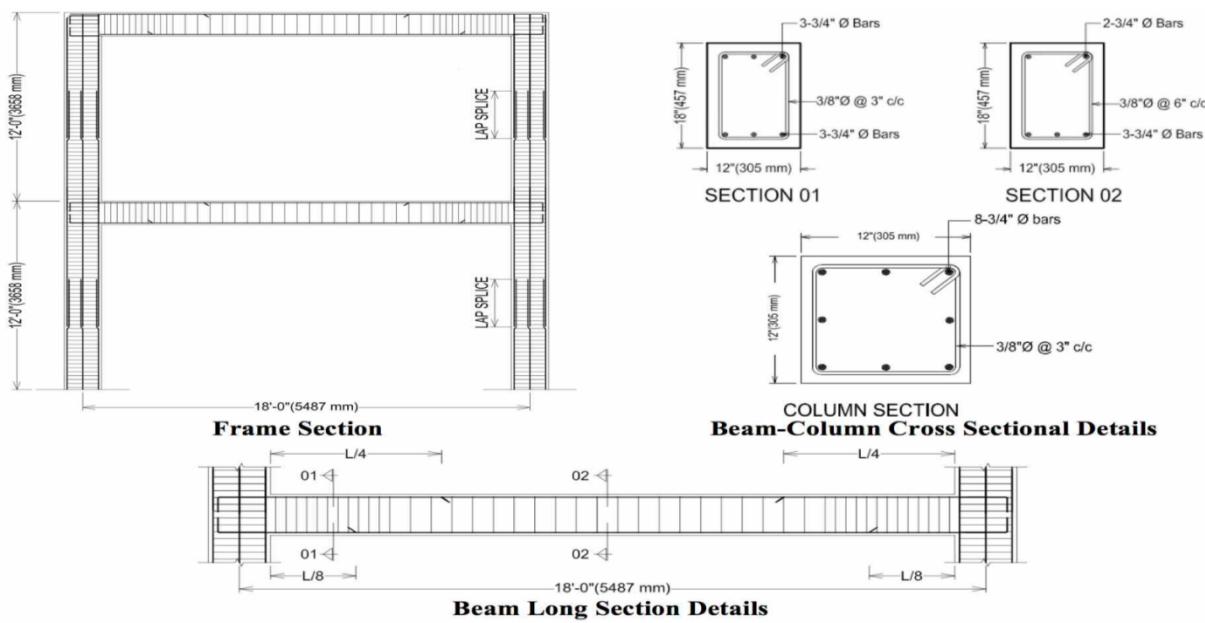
Steel reinforcement details of control frame used by Rizwan et al (2018) as well as candidate model in this study.
